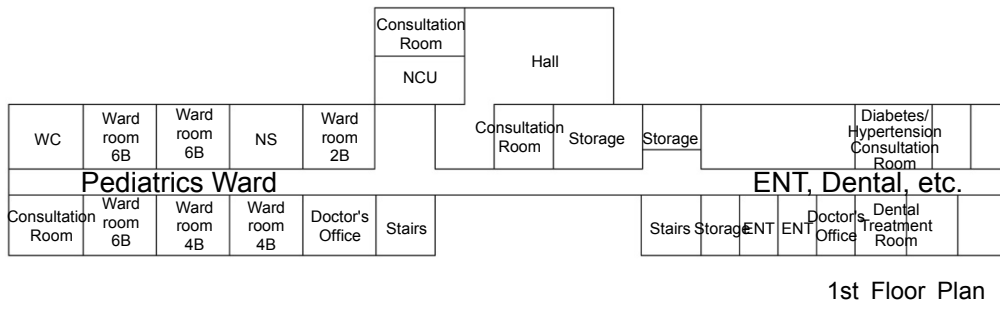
Post-Project Renovation and Relocation Plan for Existing Building B
